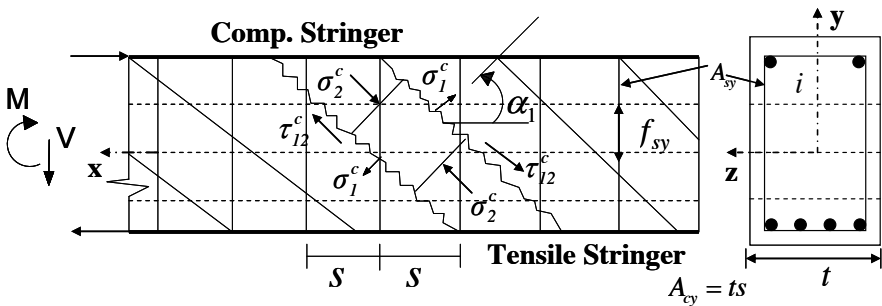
Concrete strut and transverse reinforcement equilibrium.
